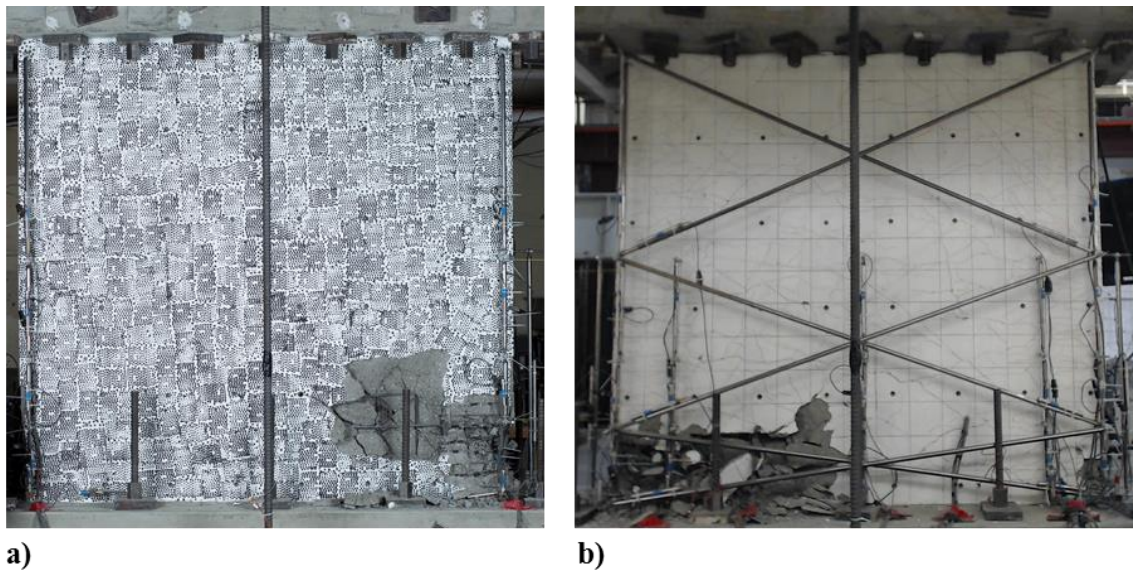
Specimen WP7 – a) Photo of front (south) face of specimen after test; and b) Photo of rear (north) face of specimen after test
